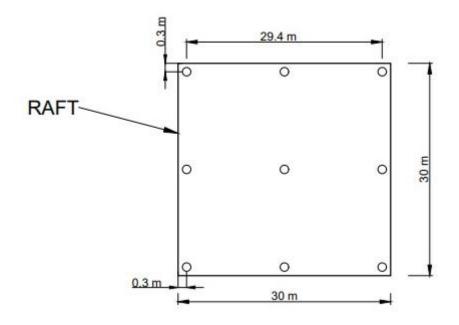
Plan showing dimensions of Piled Raft Foundation.
